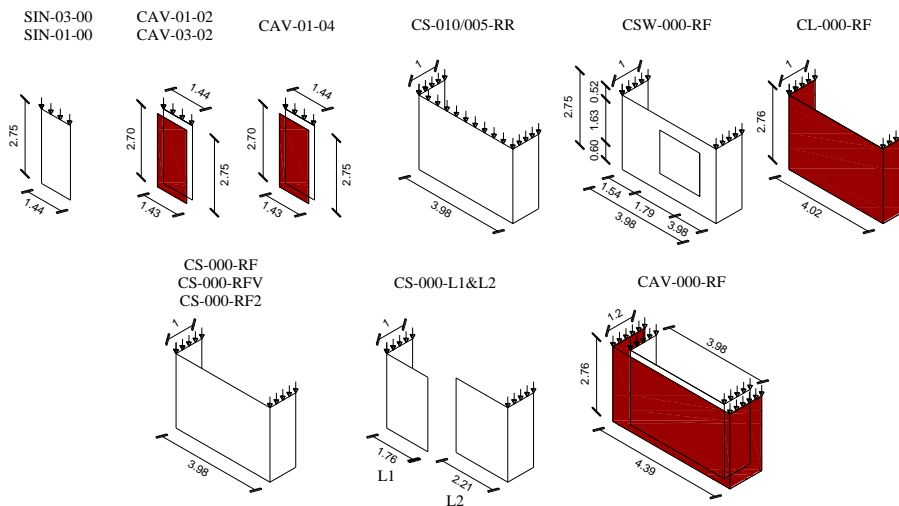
Summary scheme of specimens tested out-of-plane on shake table
